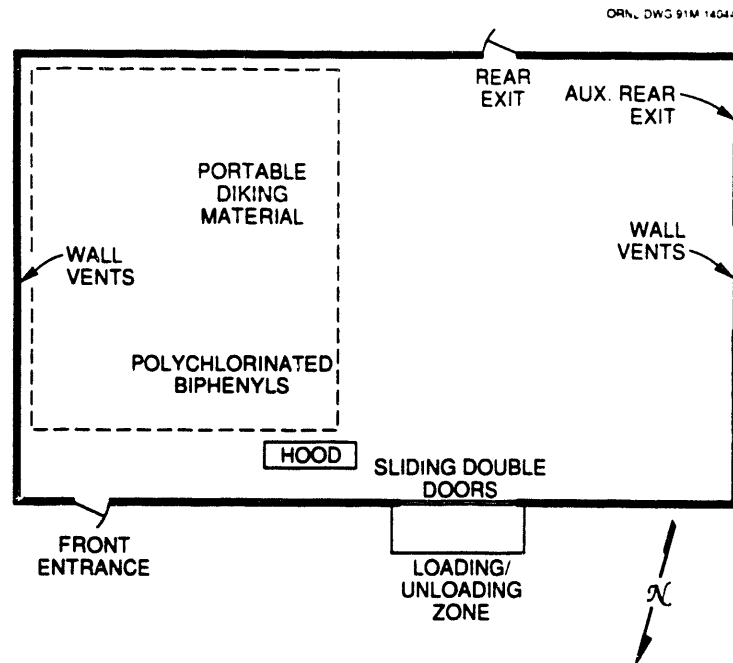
Layout of the Hazardous Waste Storage Facility (Building 7507).
